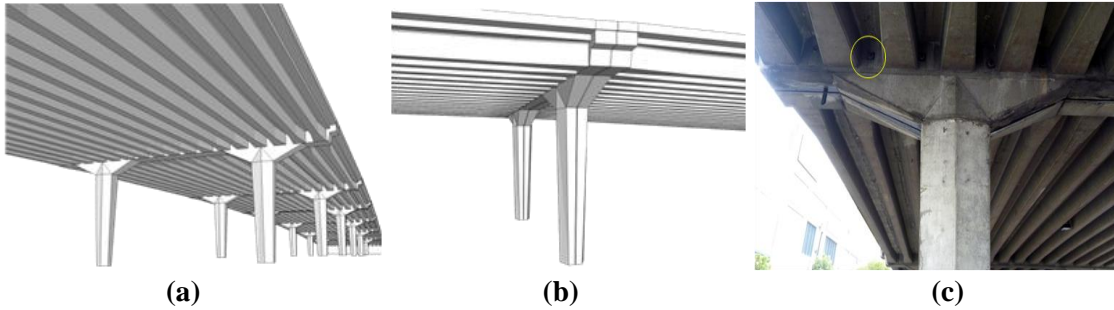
a) Illustration of pier and superstructure arrangement. b) Illustration showing typical expansion joint. c) Pier 4 expansion joint with tie bolts shown.
